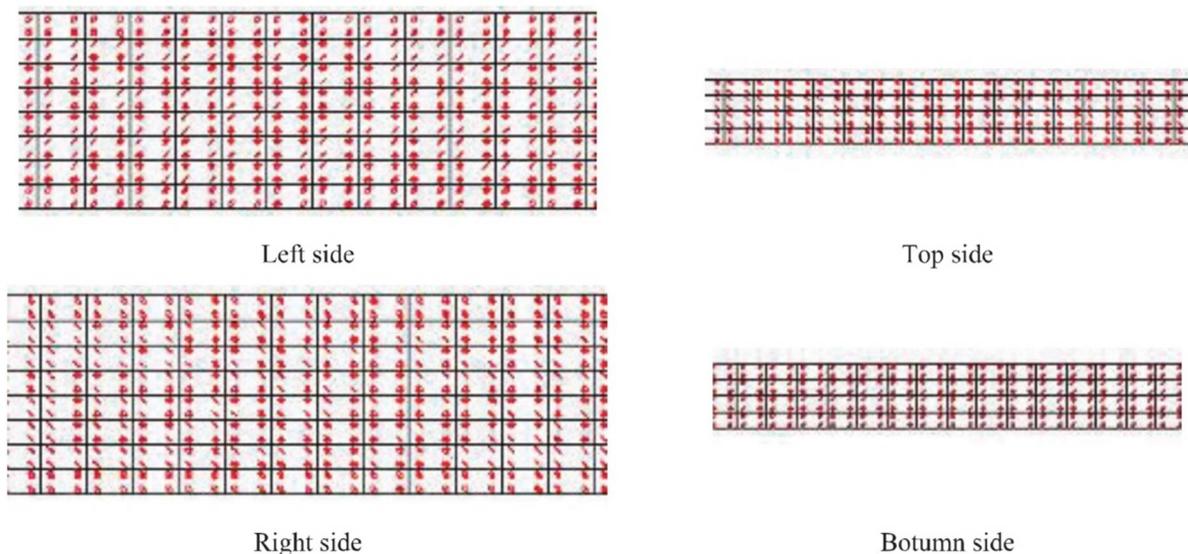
Crack at each face of the specimens by Mostofinejad D. and Talaeitaba S. B., (2011).
